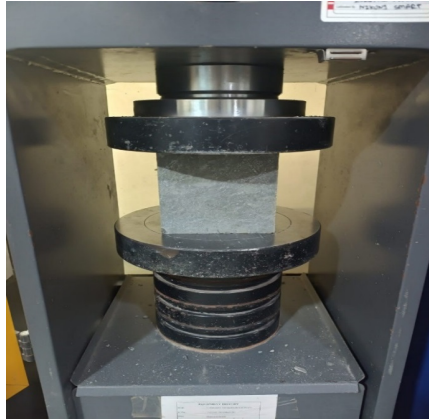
Concrete cube casted for compressive strength testing for 3, 28 & 56 day.
